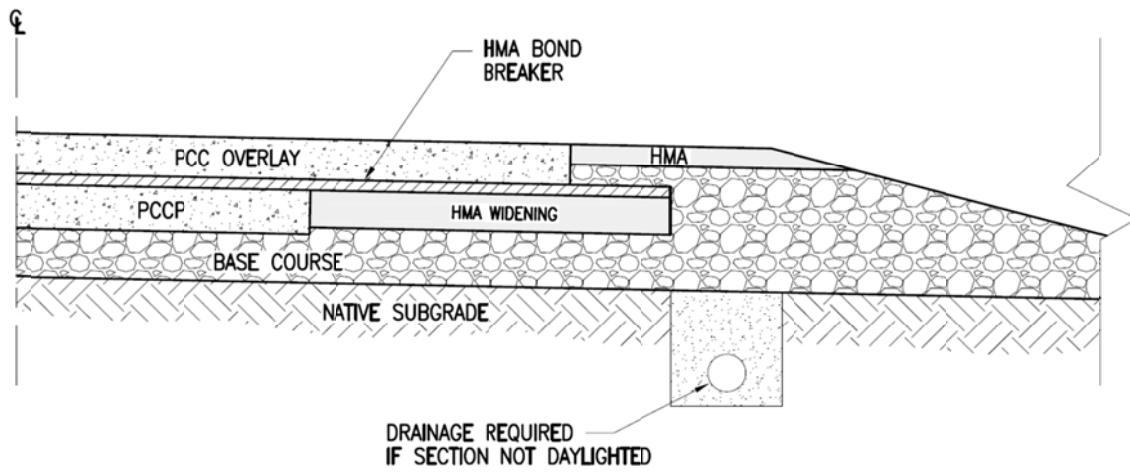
Cross section showing widening of the shoulder with daylighting or drainage.
